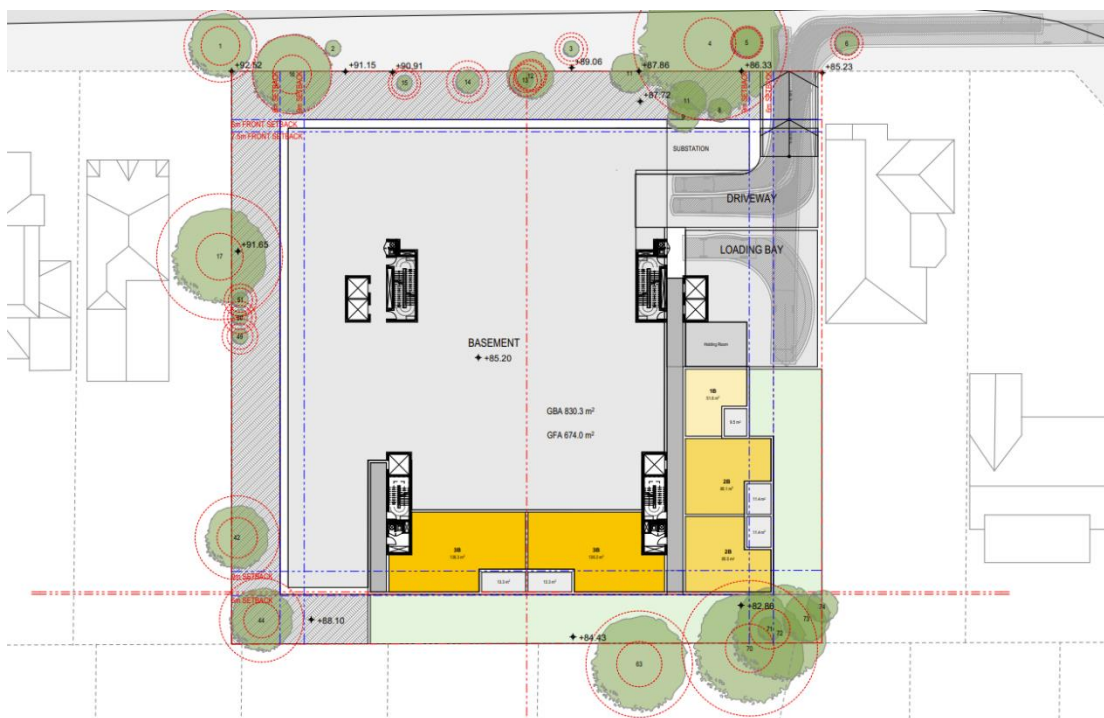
Extract of proposed plans showing the Lower Ground Floor Plan
